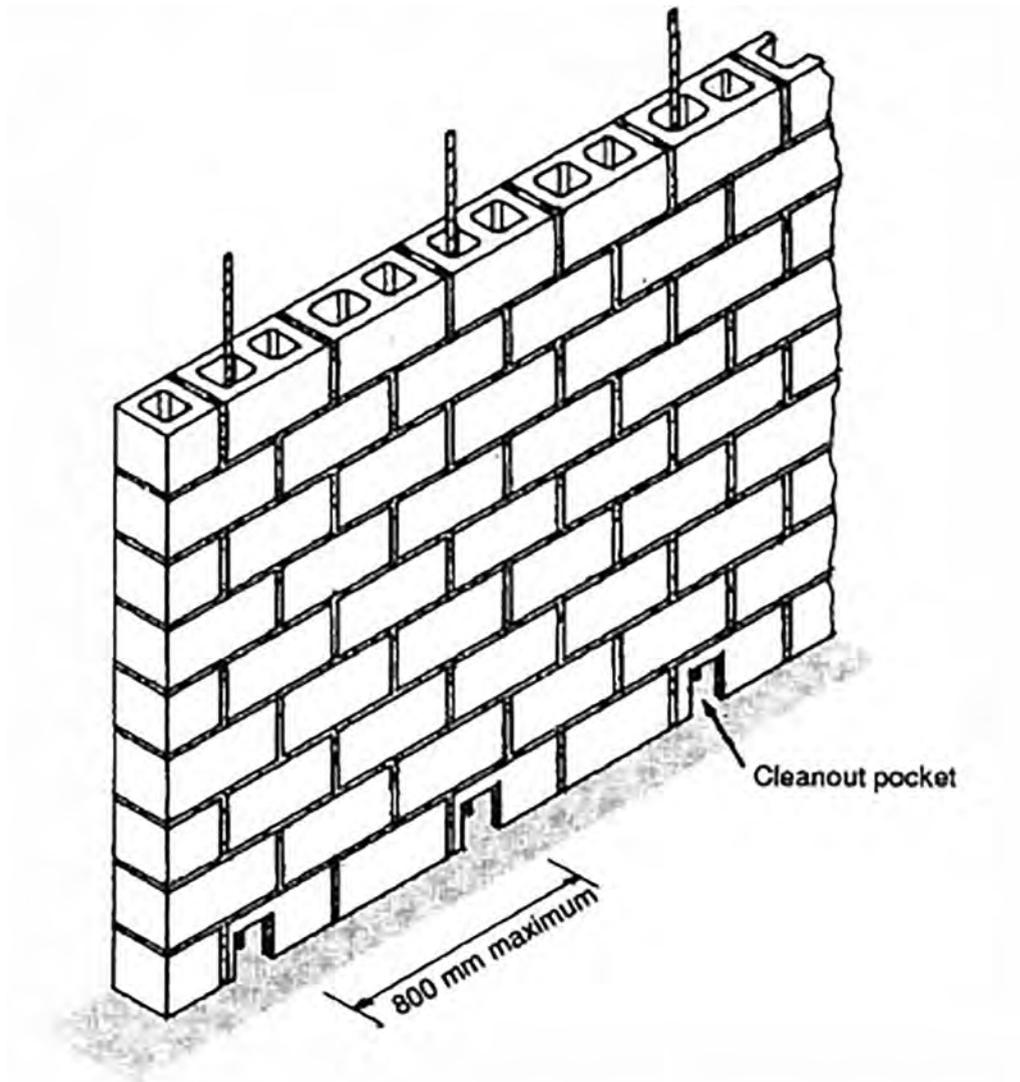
CLEANOUT POCKETS IN WALL FOR GROUT POURS
